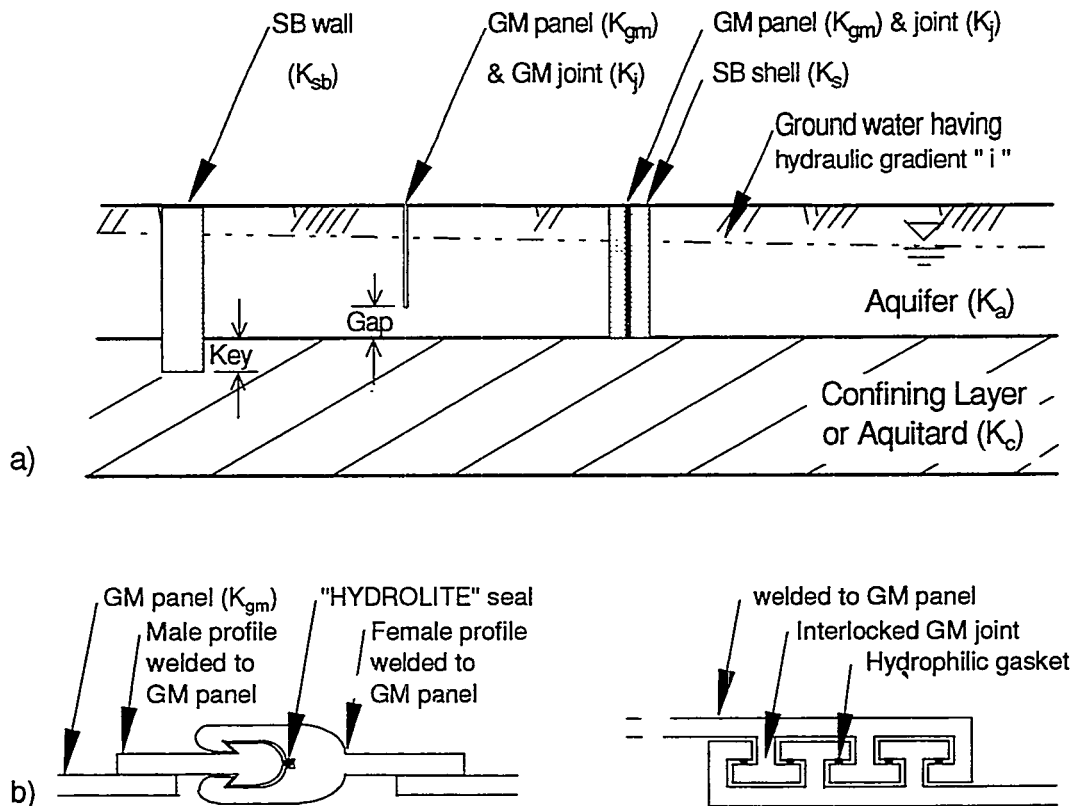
Schematics of SB, GM, and CGS cut-off walls (a) and examples of GM wall joints (b) (after Koerner and Guglielmetti 1995).
